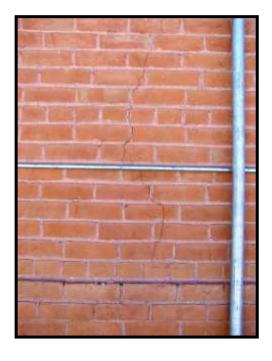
Vertical hairline crack to left of kitchen waste vent, north wall. While crack is thin, it is very long, continuing several feet downward and upward from eye level.
